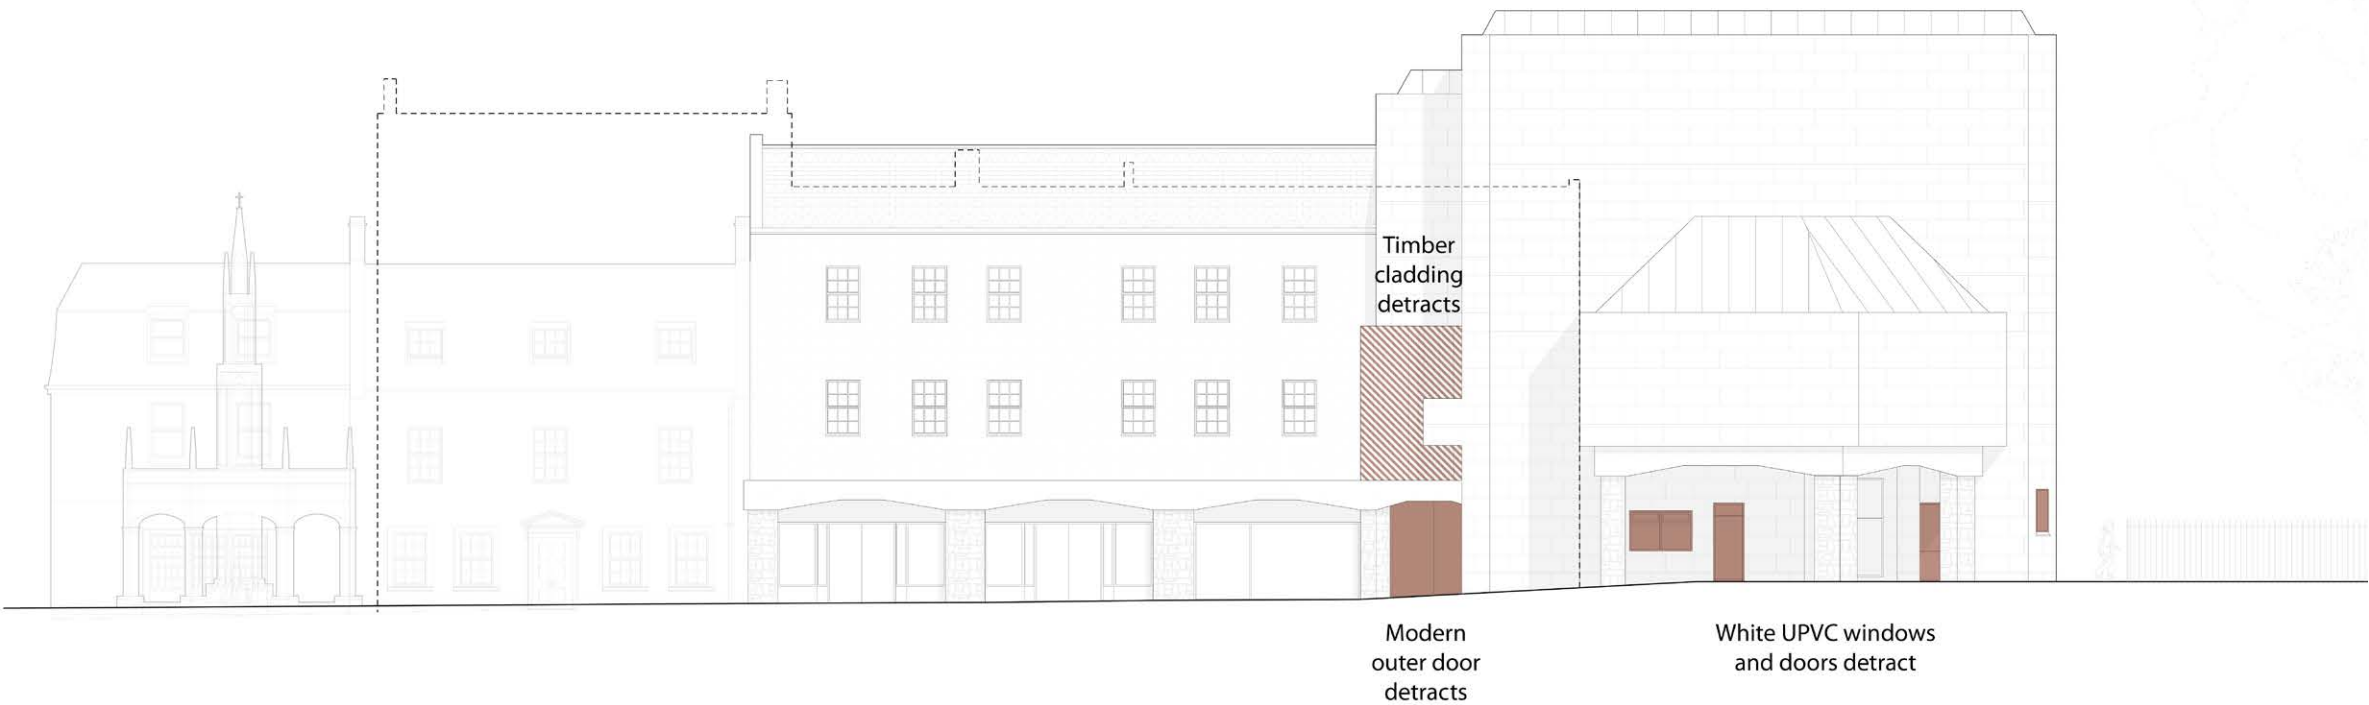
Ground floor detracting fabric [Ian Chalk Architects]
